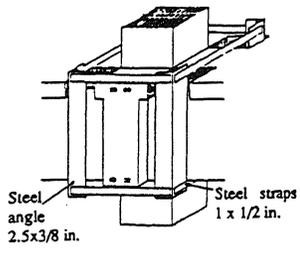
Structural steel cage assembled in the joint (Alcocer 1990)
